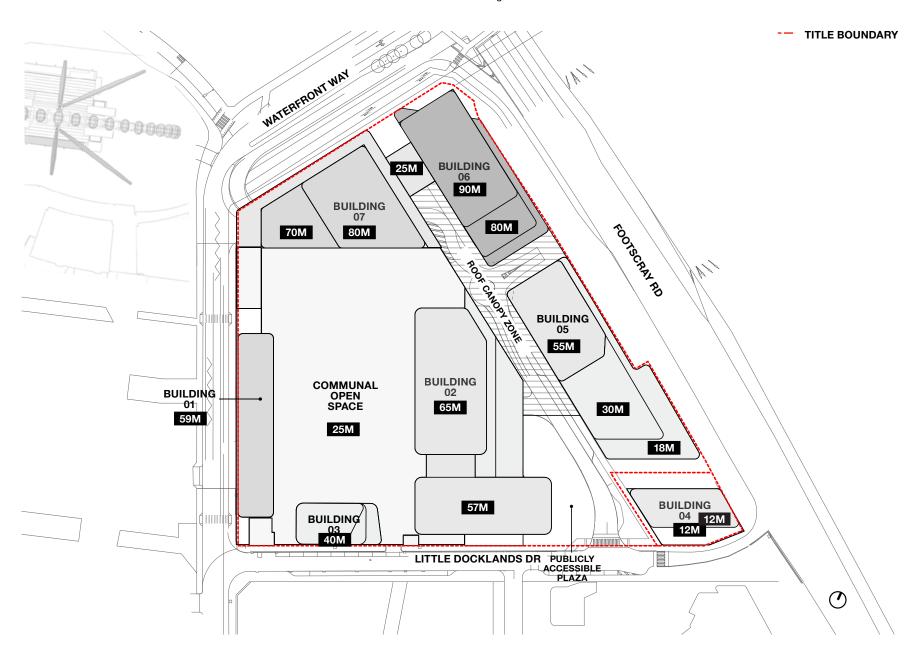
Concept Plan 5 - Maximum heights, Roof plan
